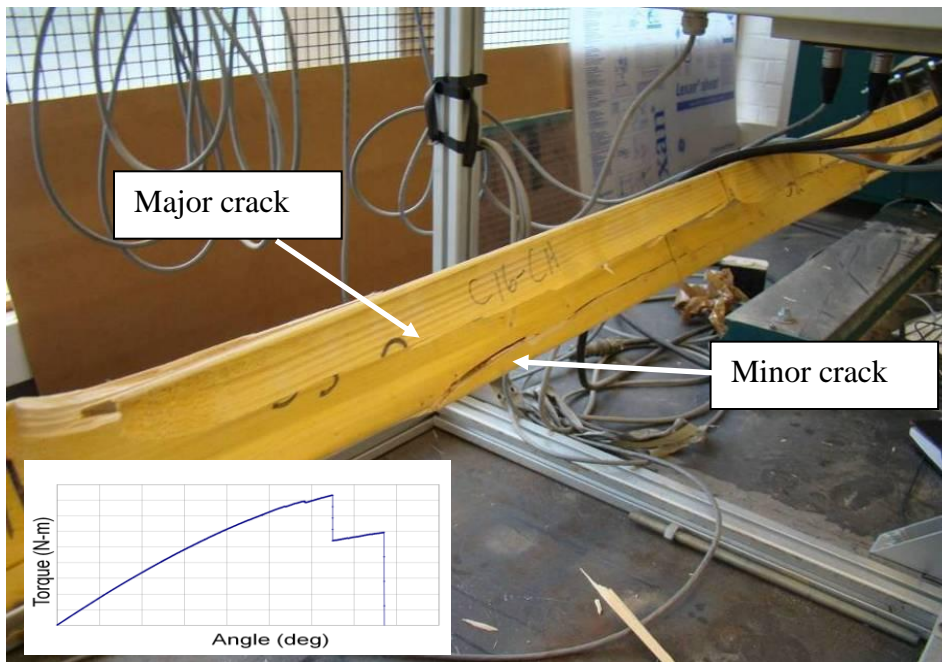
A typical Norway spruce C16 joist with a large horizontal shear crack and minor cracks
